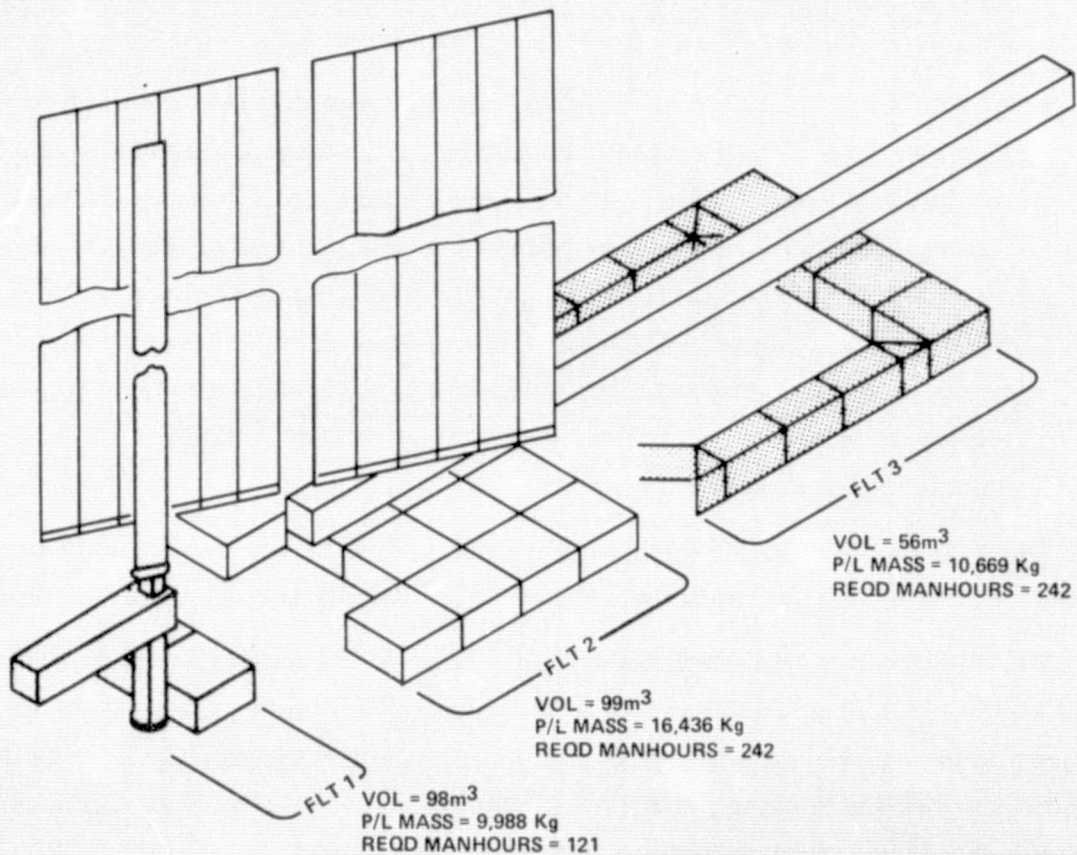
OCDA Assembly (Man Assisted by Machine)
